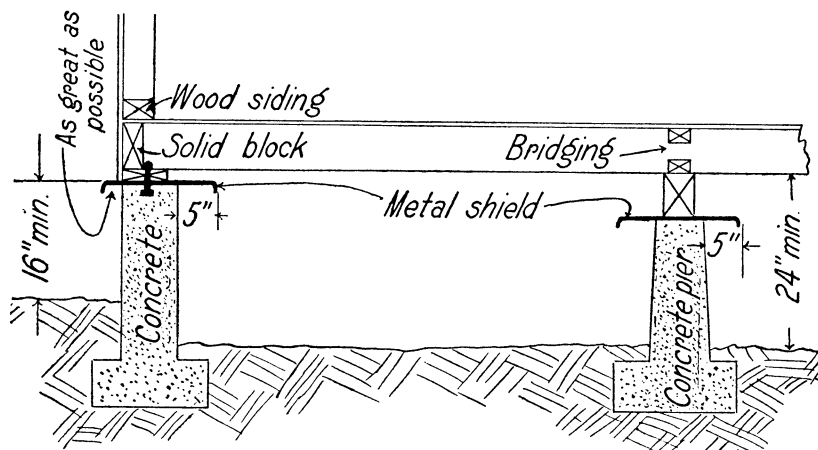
Plans for protection of buildings against subterranean termites. Modified slightly from plans issued by Mr. Walter Putnam, city superintendent of buildings, Pasadena, California. Used by permission of Mr. Putnam.
